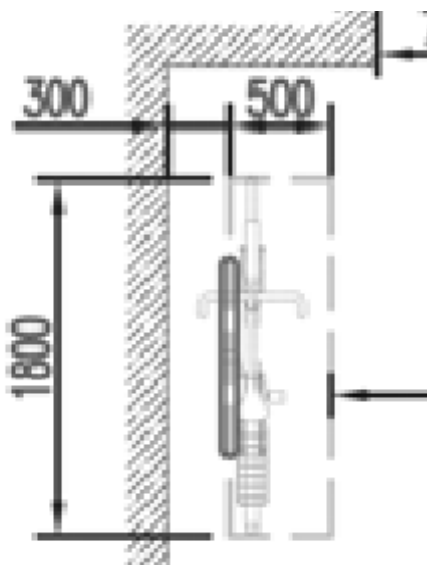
Dimensions of Sheffield stand adjacent to a wall
